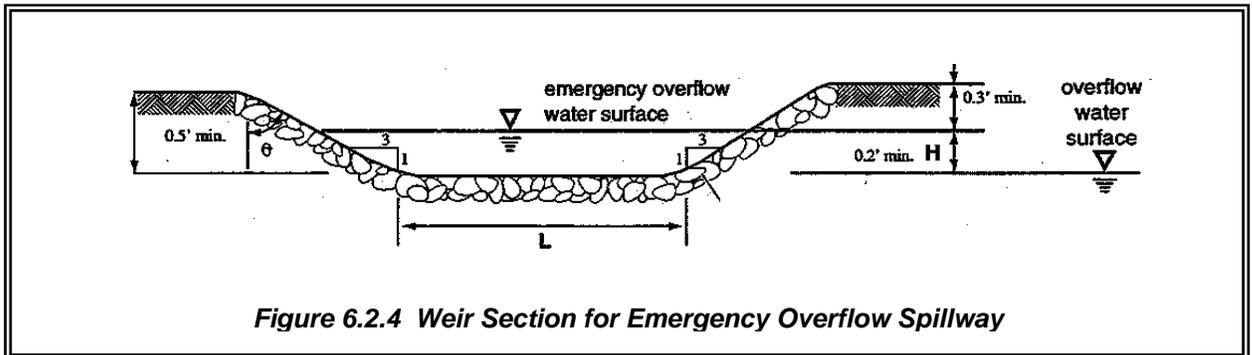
Weir Section for Emergency Overflow Spillway
